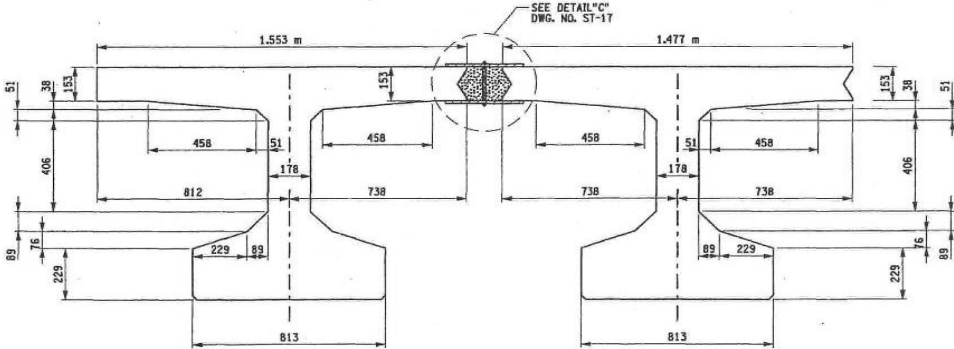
Dimensions and shear key connection in NYS DOT bridge replacement for Route 31 over Canandaigua outlet (Graybeal 2006, dimensions are in mm)
